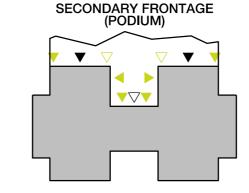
Plan diagram: First floor access with adjoining podium.
